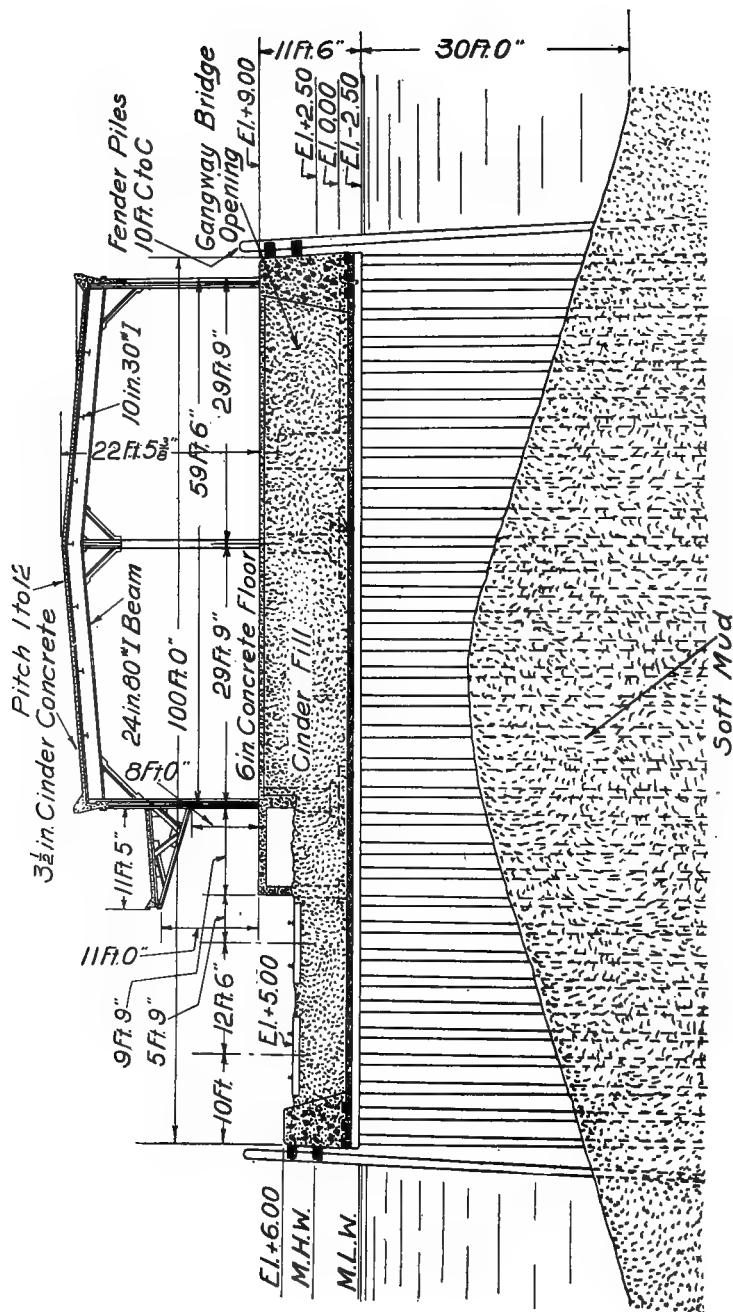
CROSS SECTION, HOBOKEN PIER NO. 7, D., L. & W. R. R.
